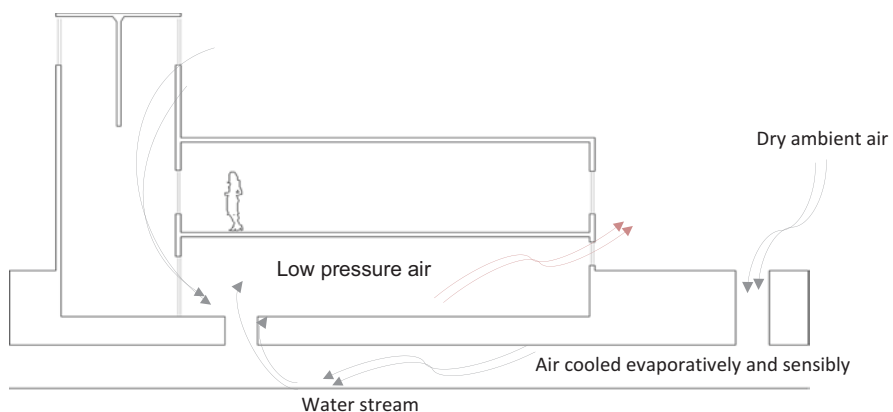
Coupling the wind tower (Baud-Geer) with an underground tunnel to promote evaporative and sensible cooling (adapted from Bahadori 1978)
